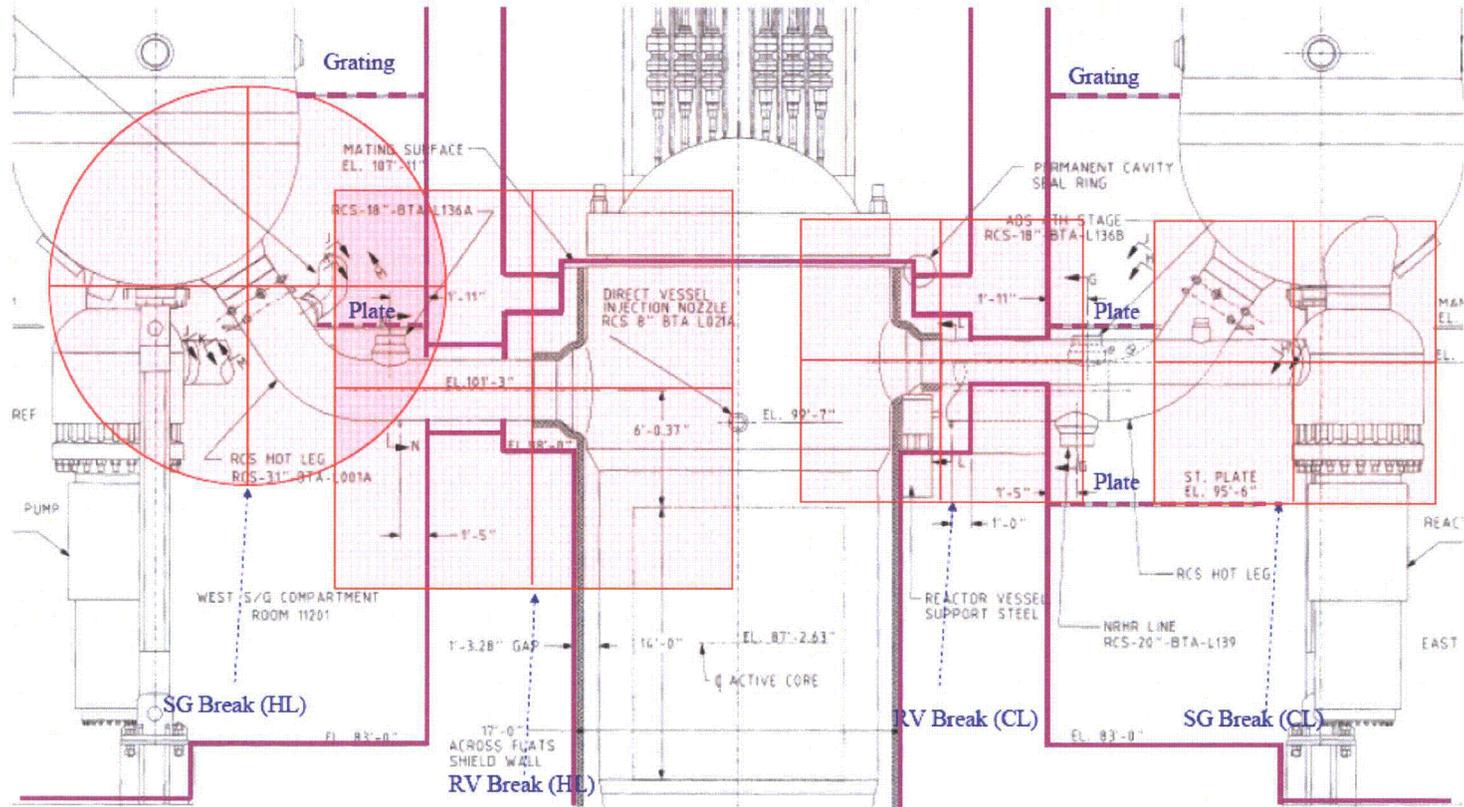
CL and HL Breaks Section View, Terminal End Break ZOIs
